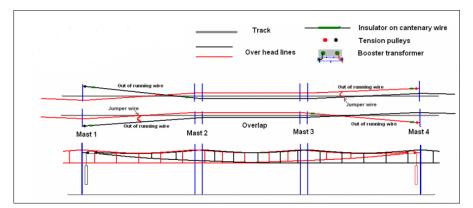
Layout of transition in overlap in an open section. (RMweb 2013)
